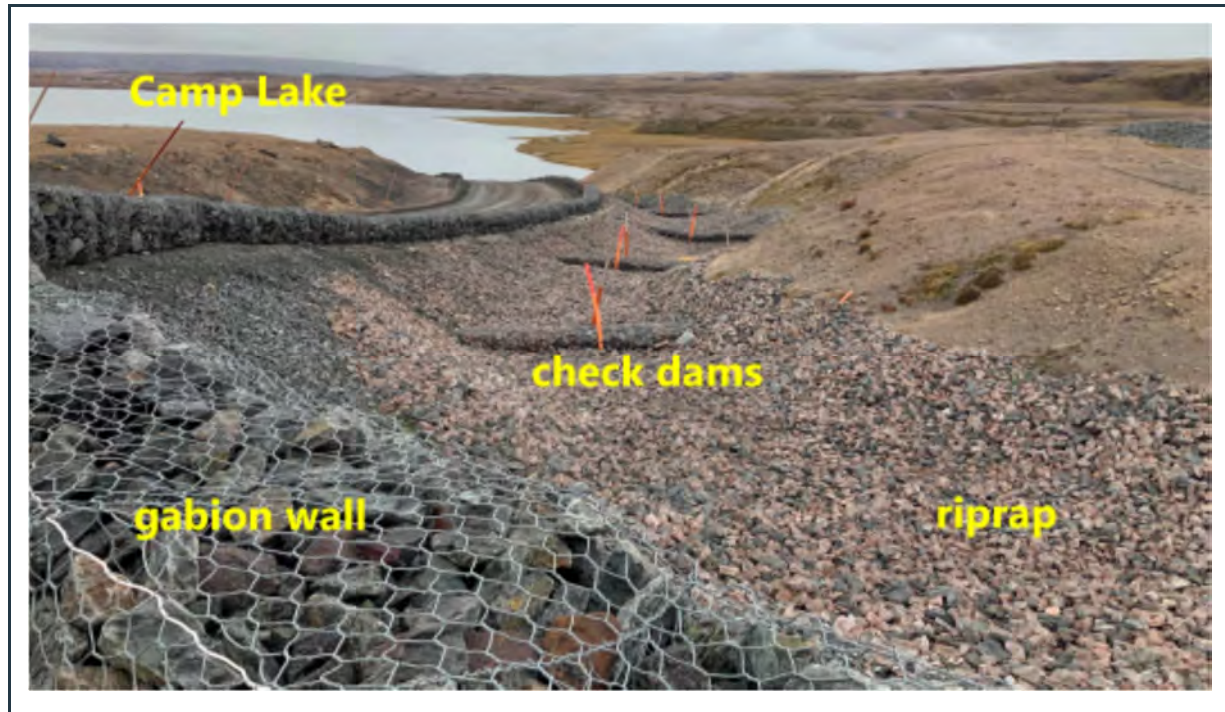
View of the upgraded Camp Lake check dams and new gabion wall in good conditions, constructed along the road to the lake.
